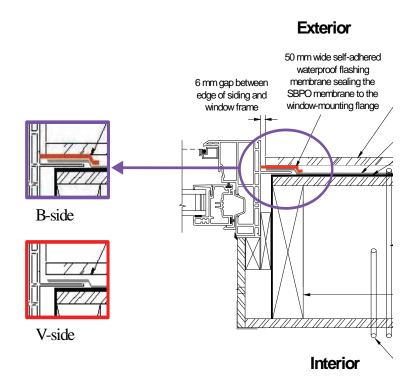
Specimen W4: Horizontal Section view of Wall-Window Interface at Jamb – specified practice (B-side, Base-case) and Variation on this practice, V-side Configuration
